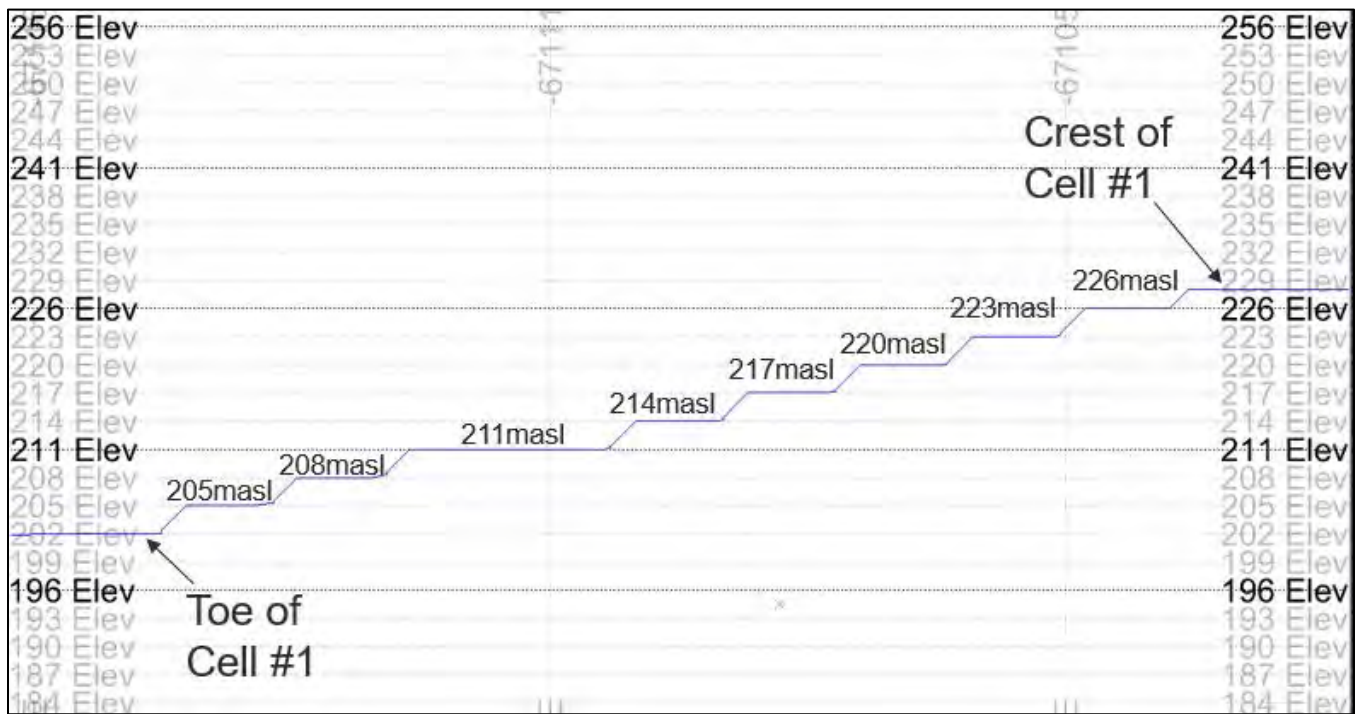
End of Year 15 – Section View of Benches, Looking East
